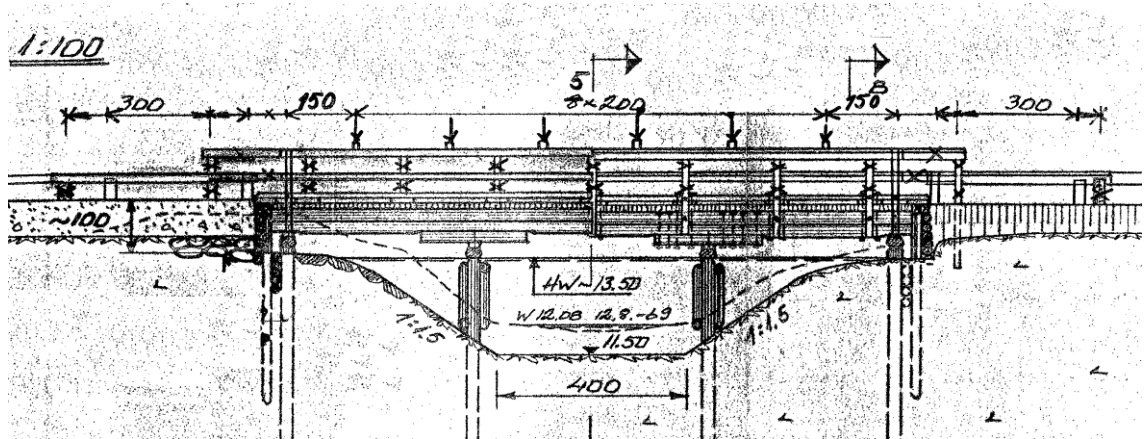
The elevation drawings of an old bridge from structural drawings from the 1970
